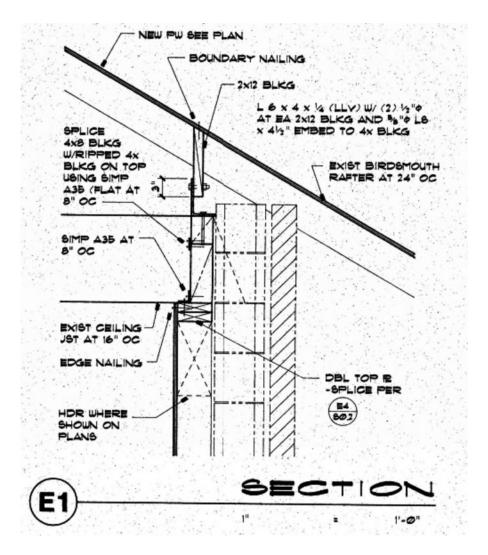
1992 retrofit detail for load path from roof diaphragm to shear wall along perimeter brick bearing walls.
